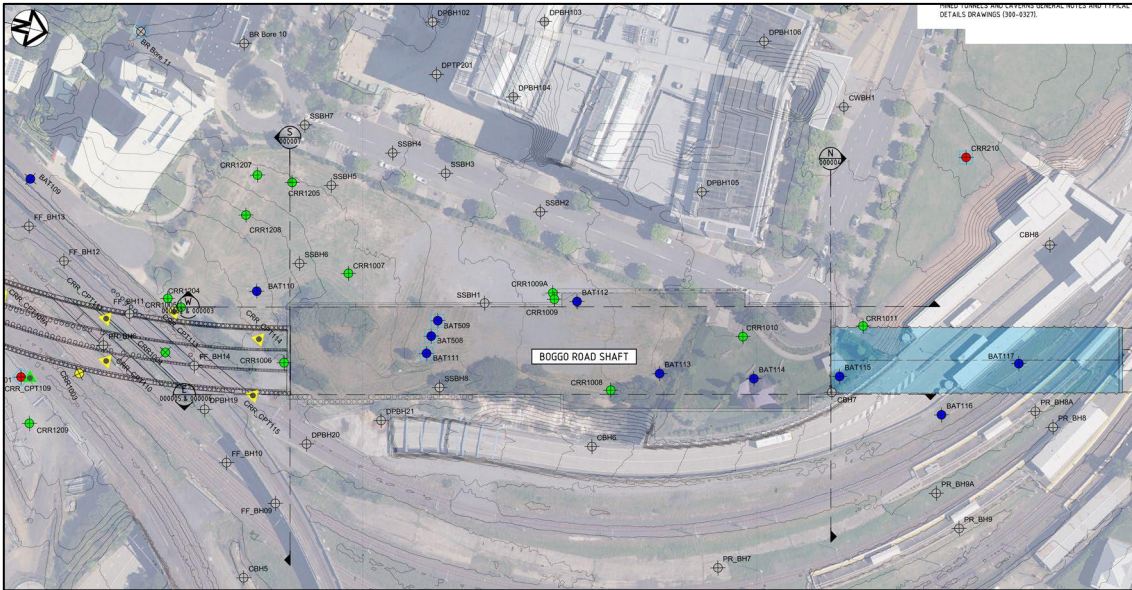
Boggo Road Station borehole plan (refer to Figure 2 for legend).
